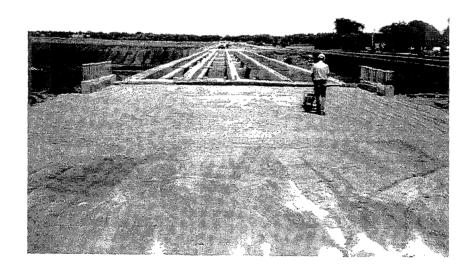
Placement of Final Lift for Geotextile Reinforced Wall, South Abutment, Bridge B
